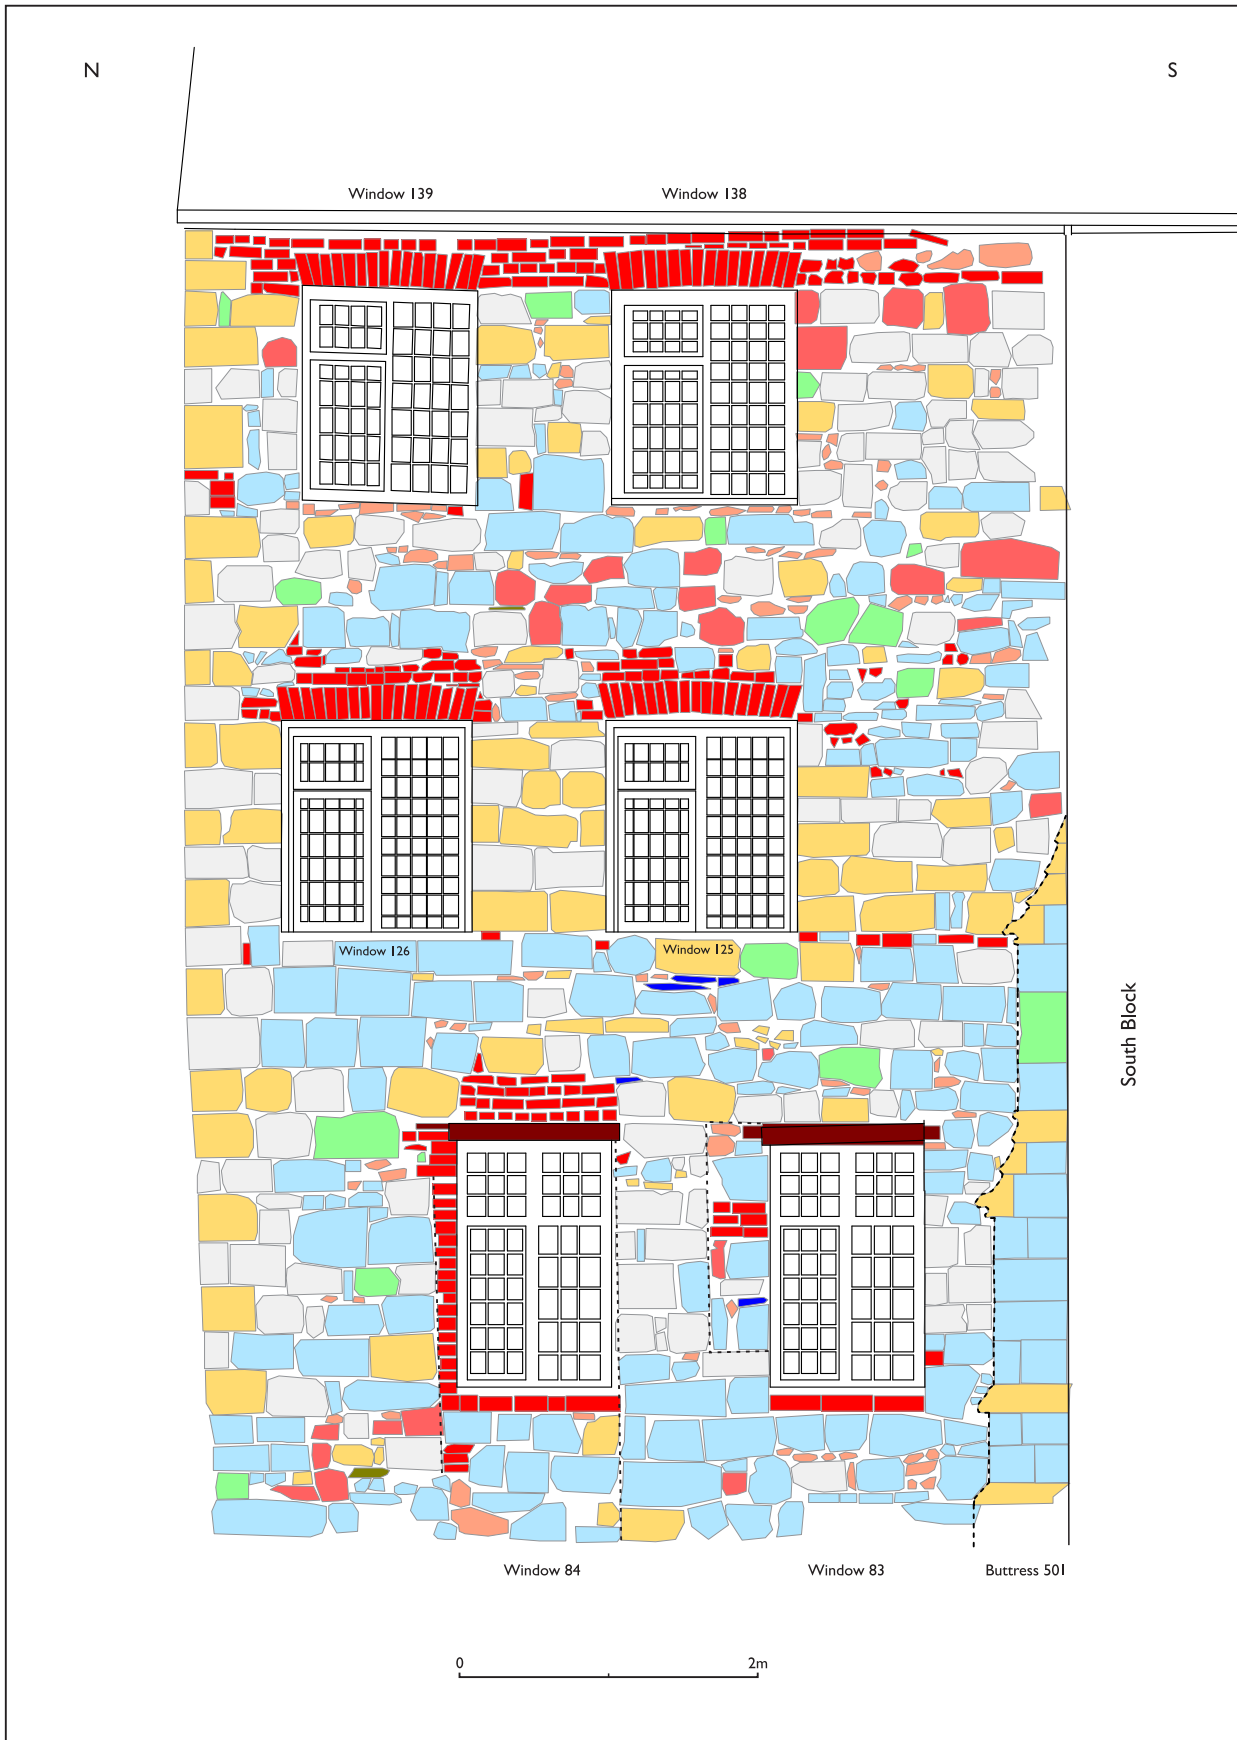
Exterior elevation of the west wall of the East Wing of Castle House. Details of Buttness 501 taken from Spencer (1910, Fig. 12). See Figure 3 on page 4 for key to colours.
